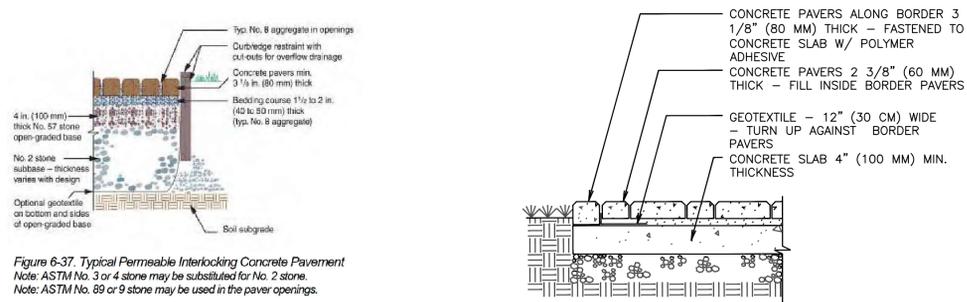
Typical Permeable Interlocking Concrete Pavement
